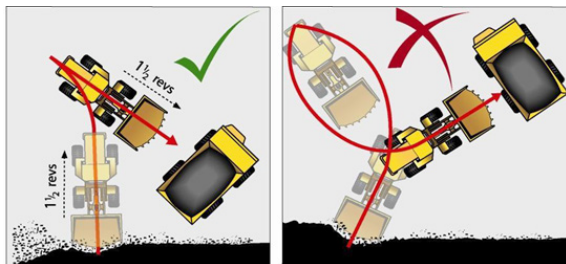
Wheel loader and truck spotting layouts (Anon. b, 2016)
